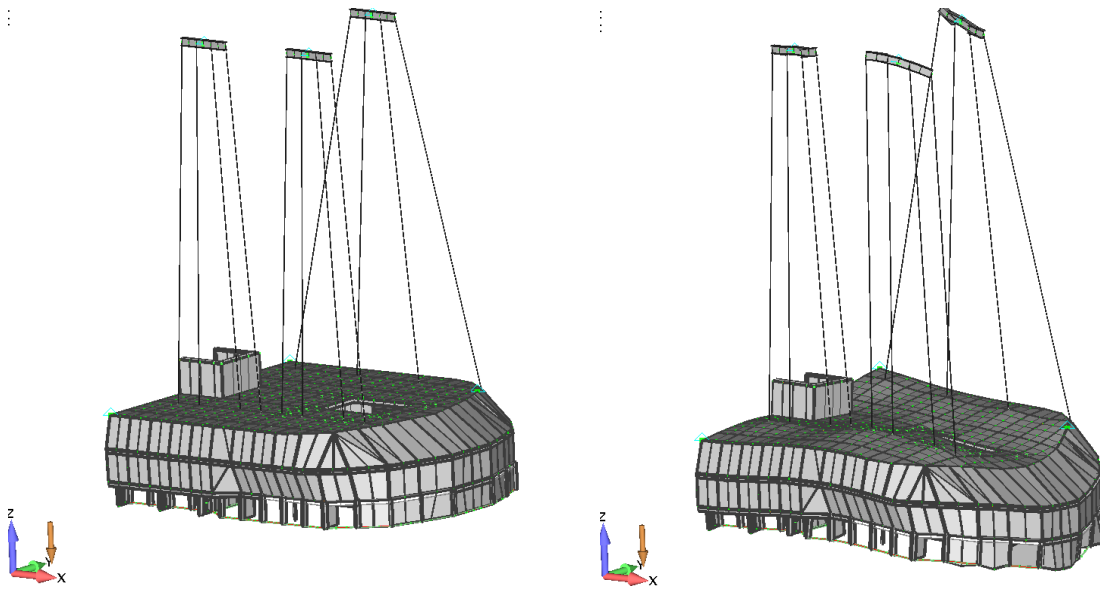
Case B: undeformed (left) and deformed (right) block lifting model in FEM.
